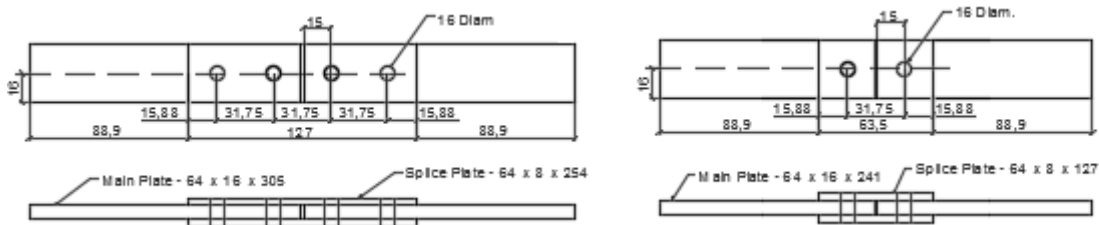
Geometry of the tested specimens: a) Two-bolt specimens; b) One-bolt specimens (dimensions in mm) (adapted from Albrecht *et al* 1984)
